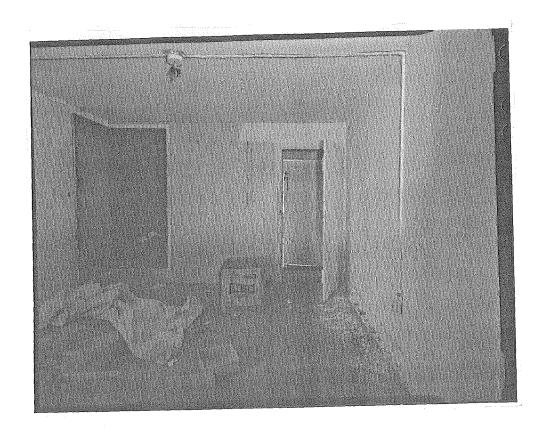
111-113 Ice Street, second floor: view of the east wall in the north middle room, looking east.
